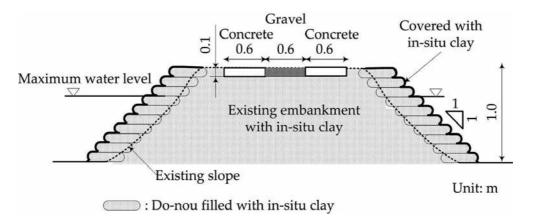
Design of concrete pavement and Do-nou retaining wall.
